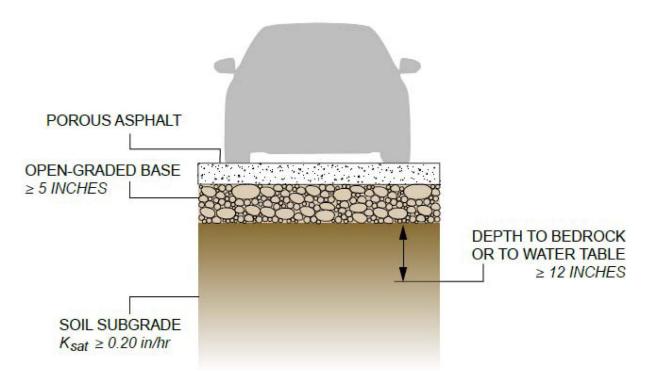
E-2 Typical cross-section for Porous Asphalt.
